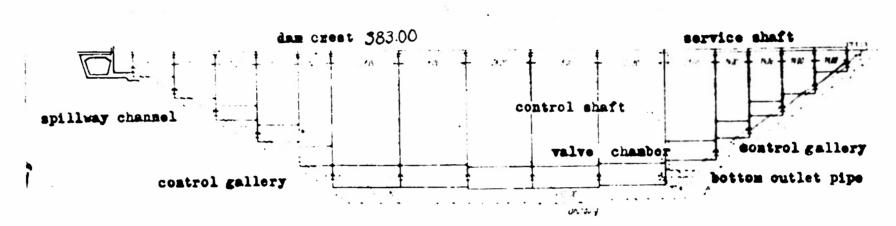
Fig. IV Oder Dam - Hartz: Cross section thru concrete core from downstream.
